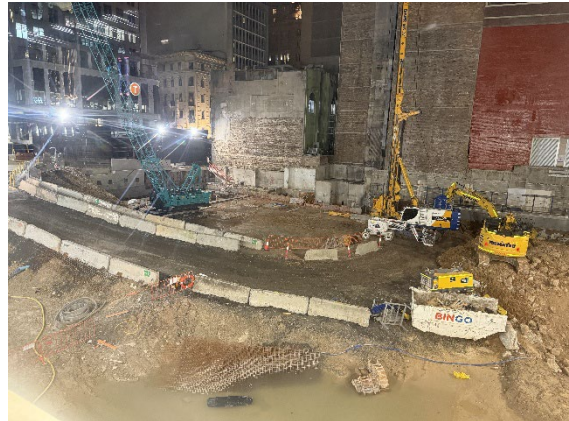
Hunter Street West: Commencement of piling for the king piles required for the steel deck.
